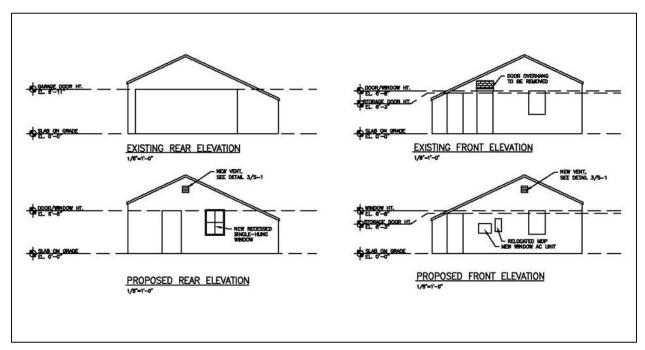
Existing and proposed alley-facing (south) and interior-facing (north) elevations from application
